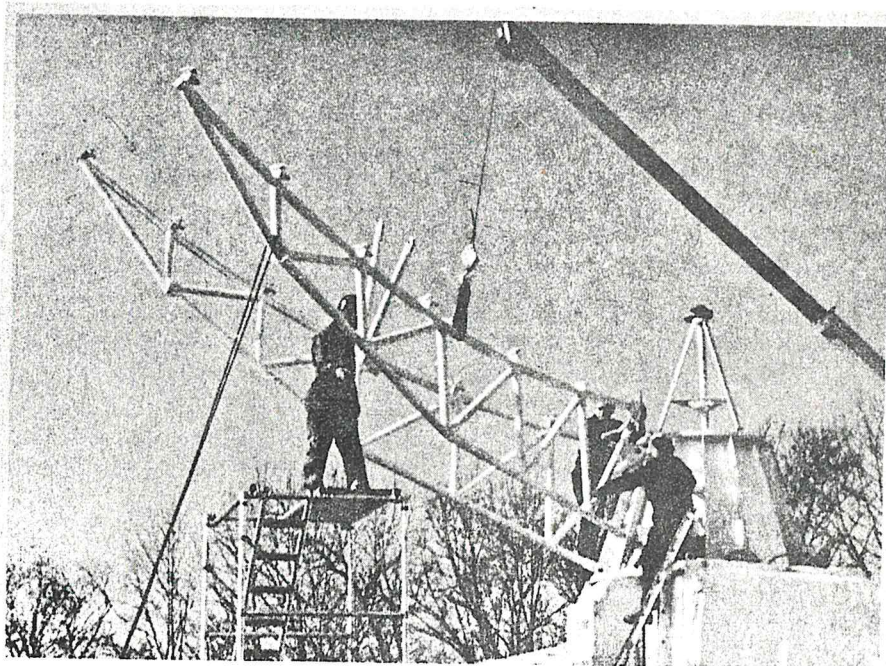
ASSEMBLE REFLECTOR BACK-UP STRUCTURE
